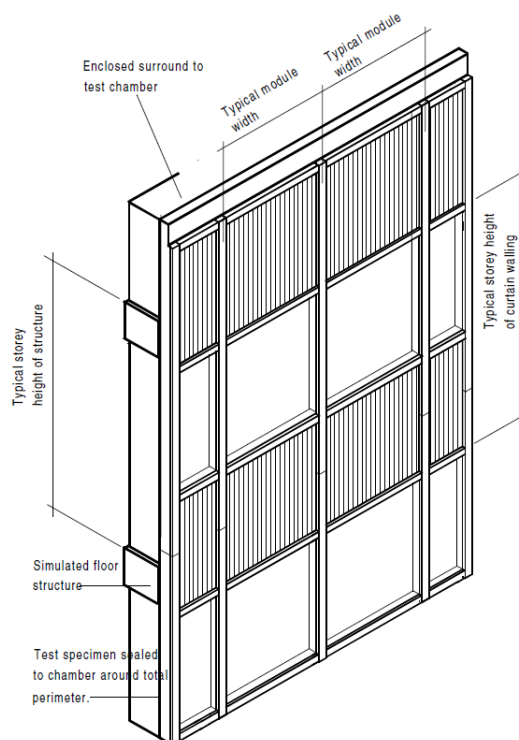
Example of test specimen built onto test chamber (NEN 12153)
